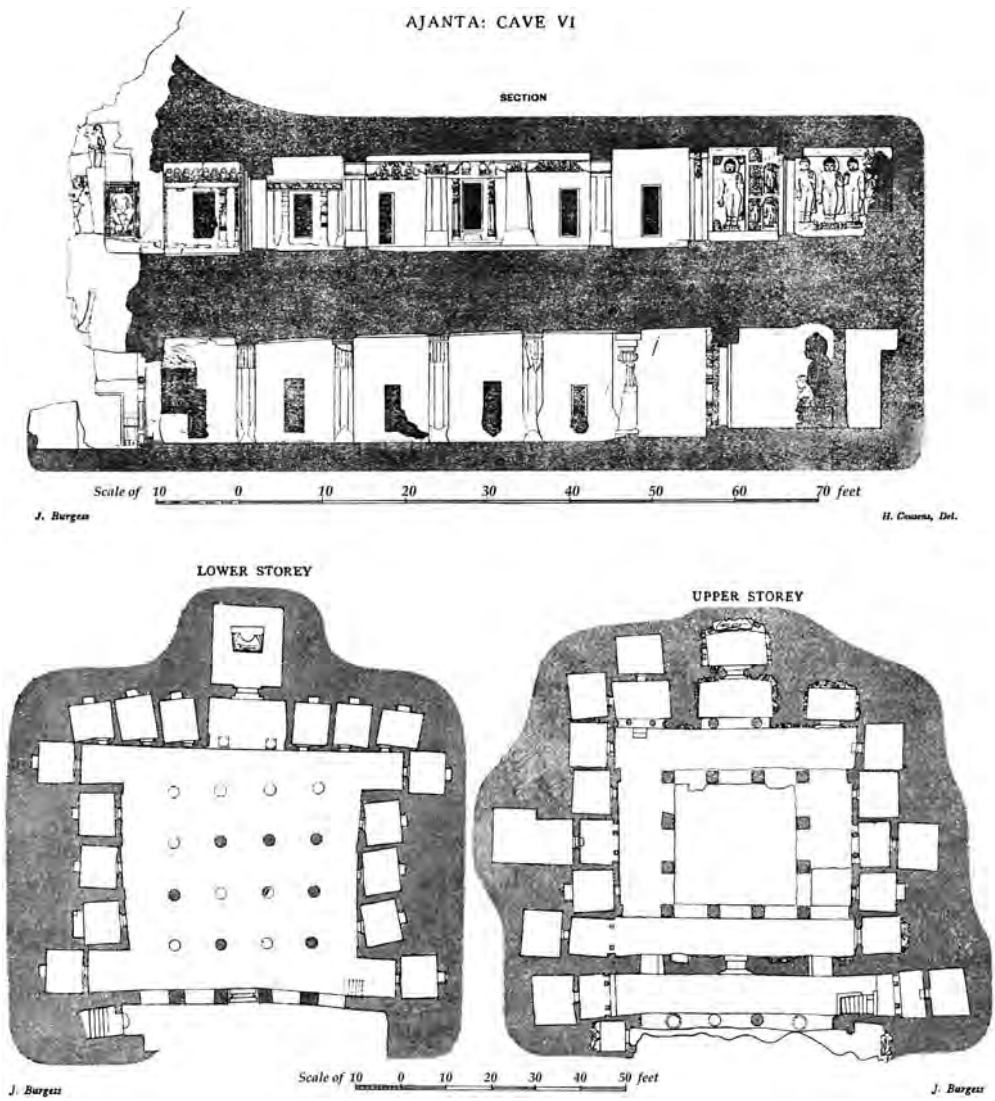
Ajanta Cave 6: Upper and Lower Plans: (CTI 32) long. sections (BCT 26)
